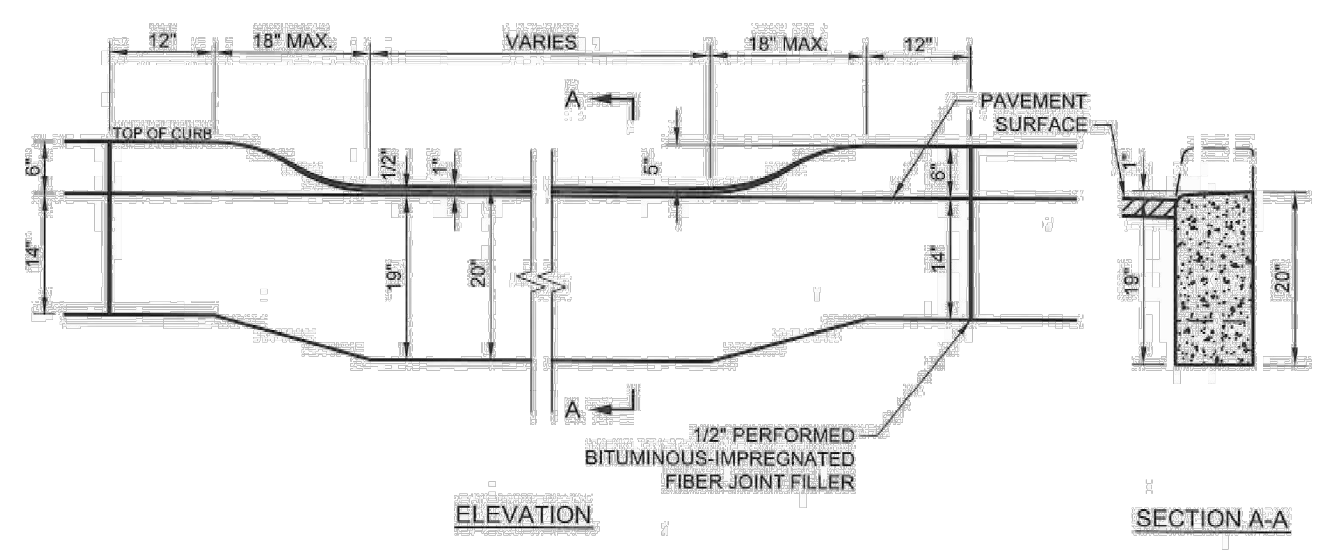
MORRIS COUNTY TYPICAL DETAIL DEPRESSED CONCRETE CURB DETAIL NOT TO SCALE 5/2011 MOC
